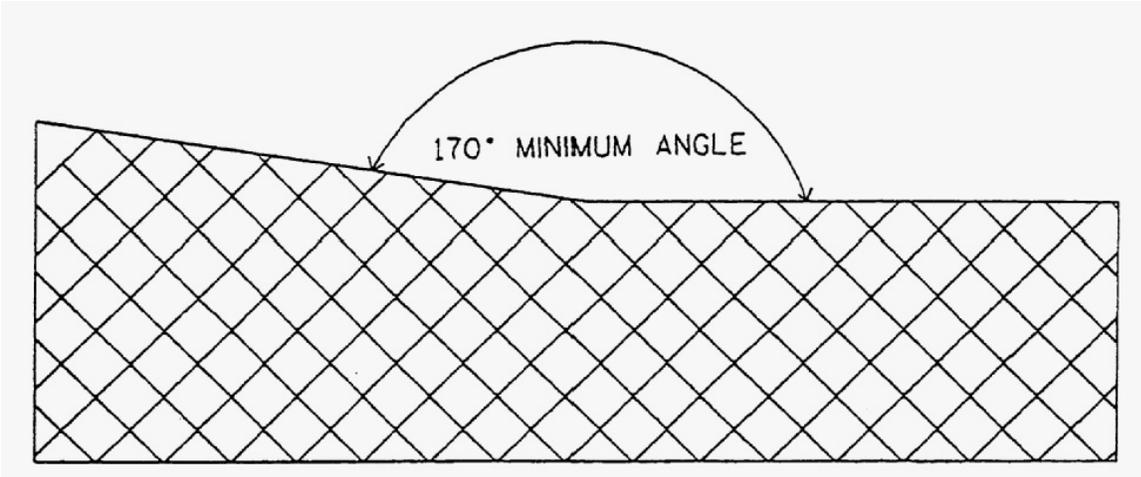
Detail of Detectable Warning on Ramp Walk Surface
